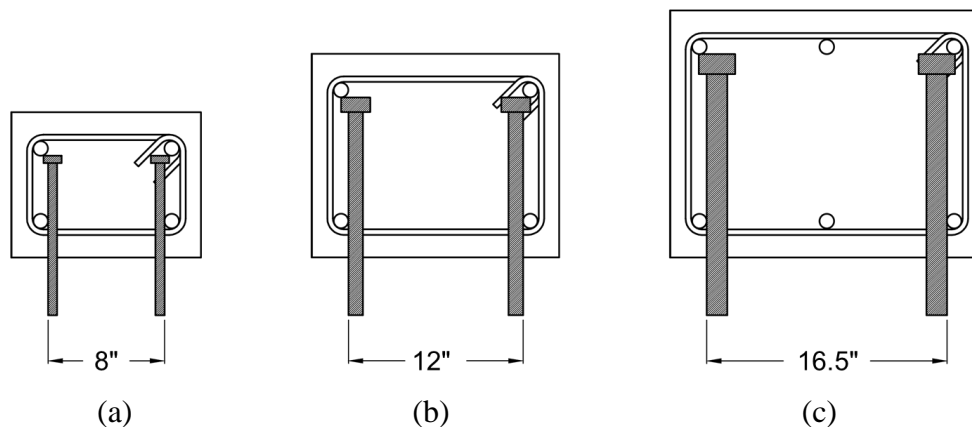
Cross sections of standard specimens (a) No. 5 headed bars, (b) No. 8 headed bars, (c) No. 11 headed bars
